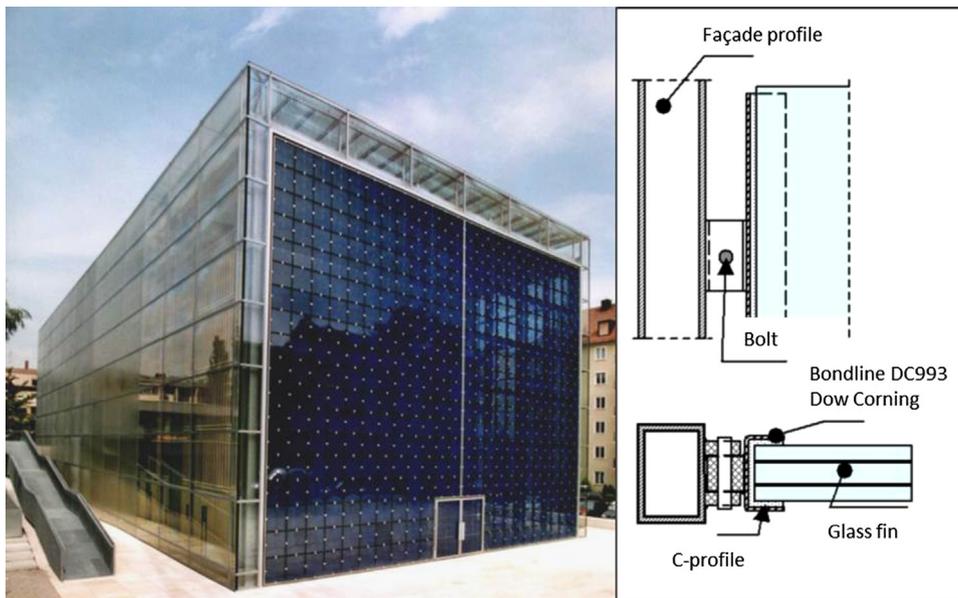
Left: view Herz Jesu Church; right: detail connection vertical glass fin; [1].
